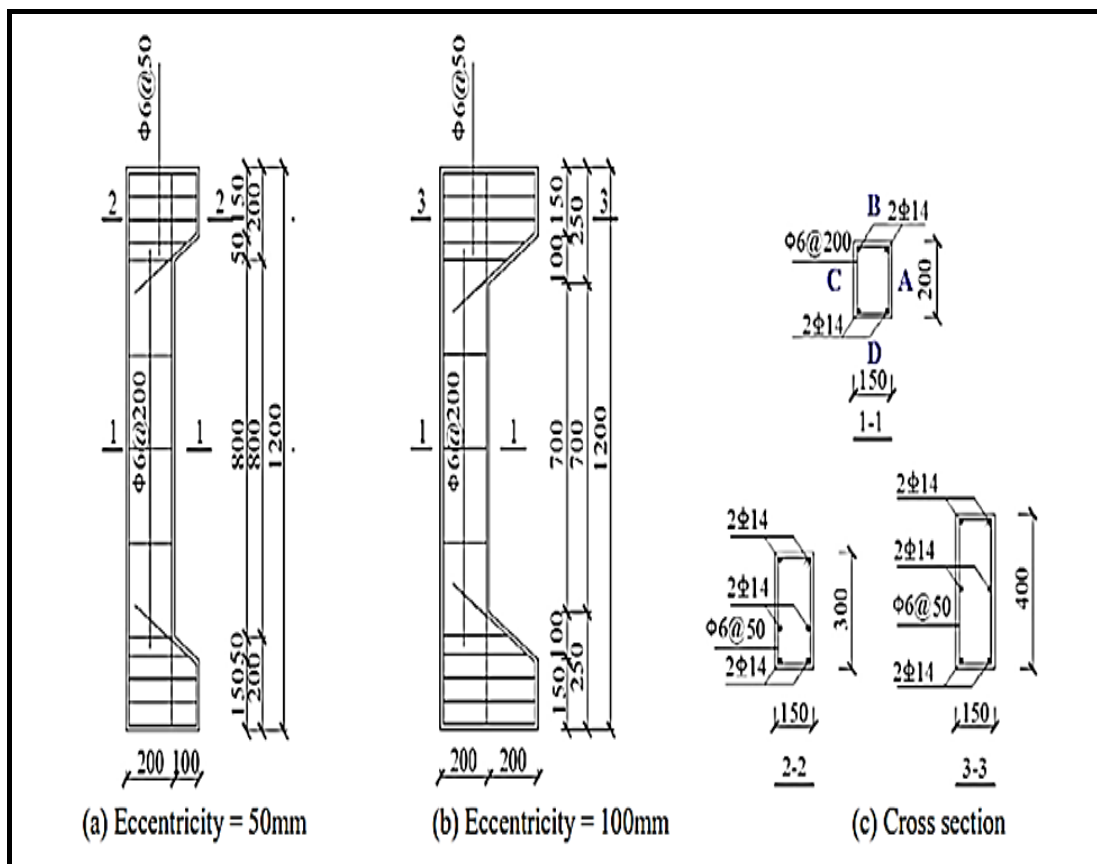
12. Section dimension and reinforcement details of specimens (Yang et al. (2018))
